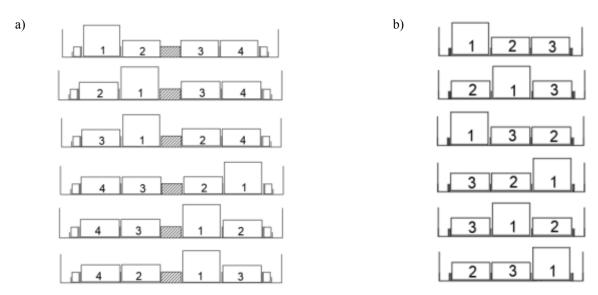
Traffic load configurations: Bridge #1 (a) and Bridge #2 (b).
